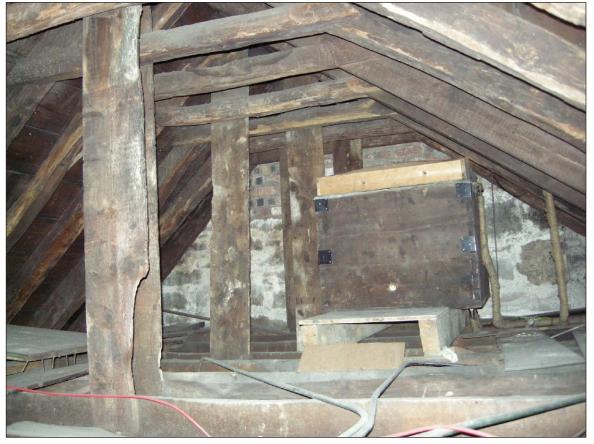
South Block, general view of the A-frame roof trusses at the west end
